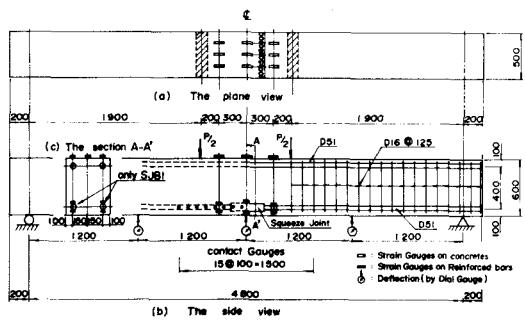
Dimension and Gauge Position of R.C. Beam with Squeeze Joint
